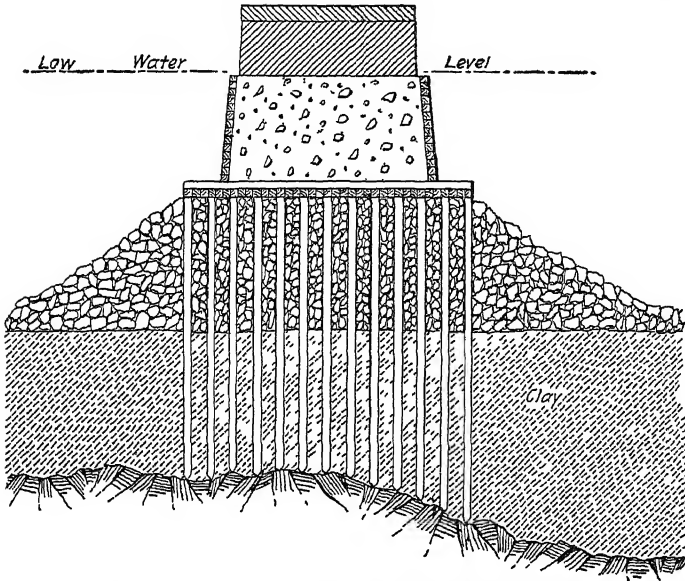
PILE AND CRIB FOUNDATION FOR A BRIDGE PIER
